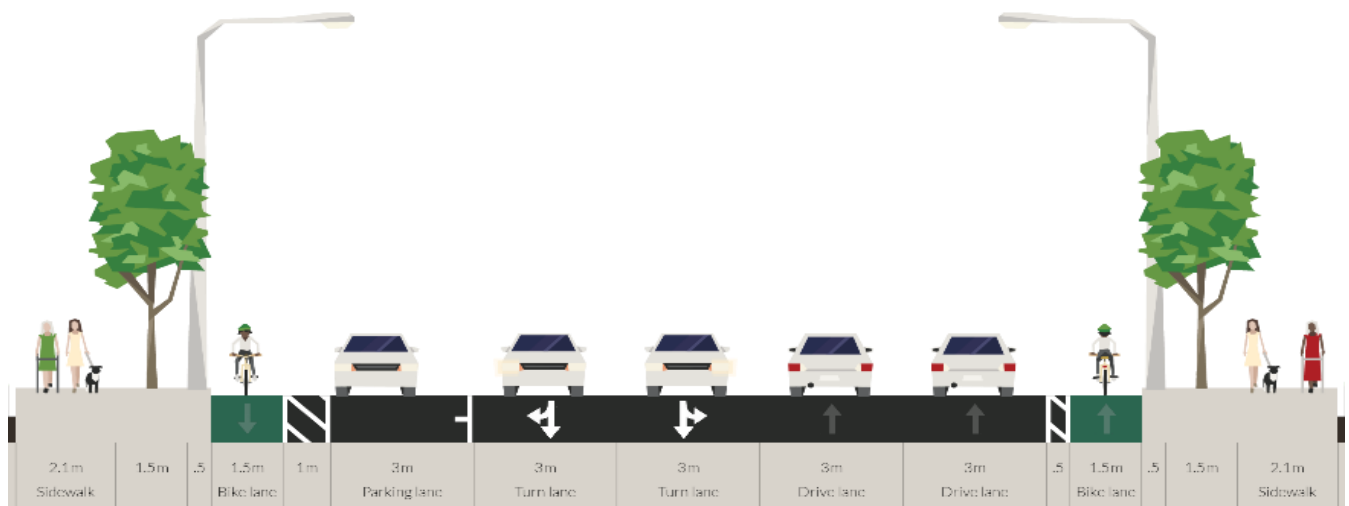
Recommended Cross-section of Beecroft Rd at Sheppard Ave. W (Looking North)
